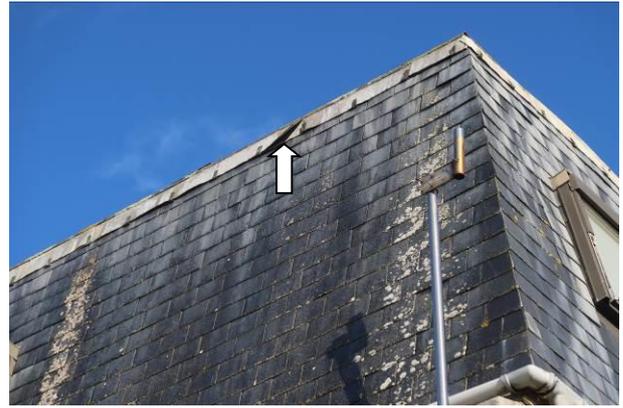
Showing an example of the gaps allowing potential access beneath slate tiles in the plant room; similar features exist on the rear porch.
